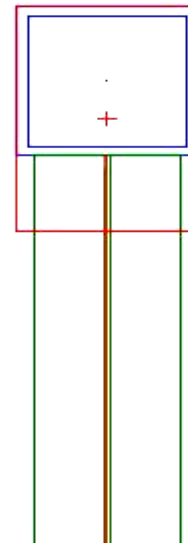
Plan View of Column, Beam & Plate in 2D wireframe
